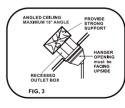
, 2 and 3 are examples of different ways to mount the outlet box.
